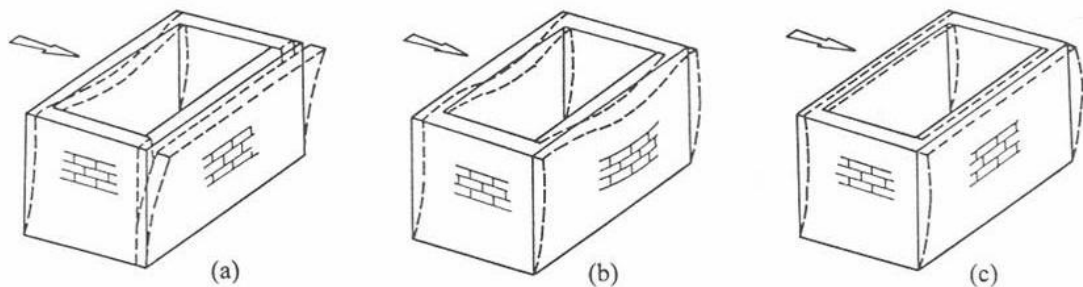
Effect of types of diaphragm on face-loaded walls – a) inferior wall-to-wall connection and no diaphragm, b) good wall-to-wall connection and ring beam with flexible diaphragm, c) good wall-to-wall connection and rigid diaphragm
